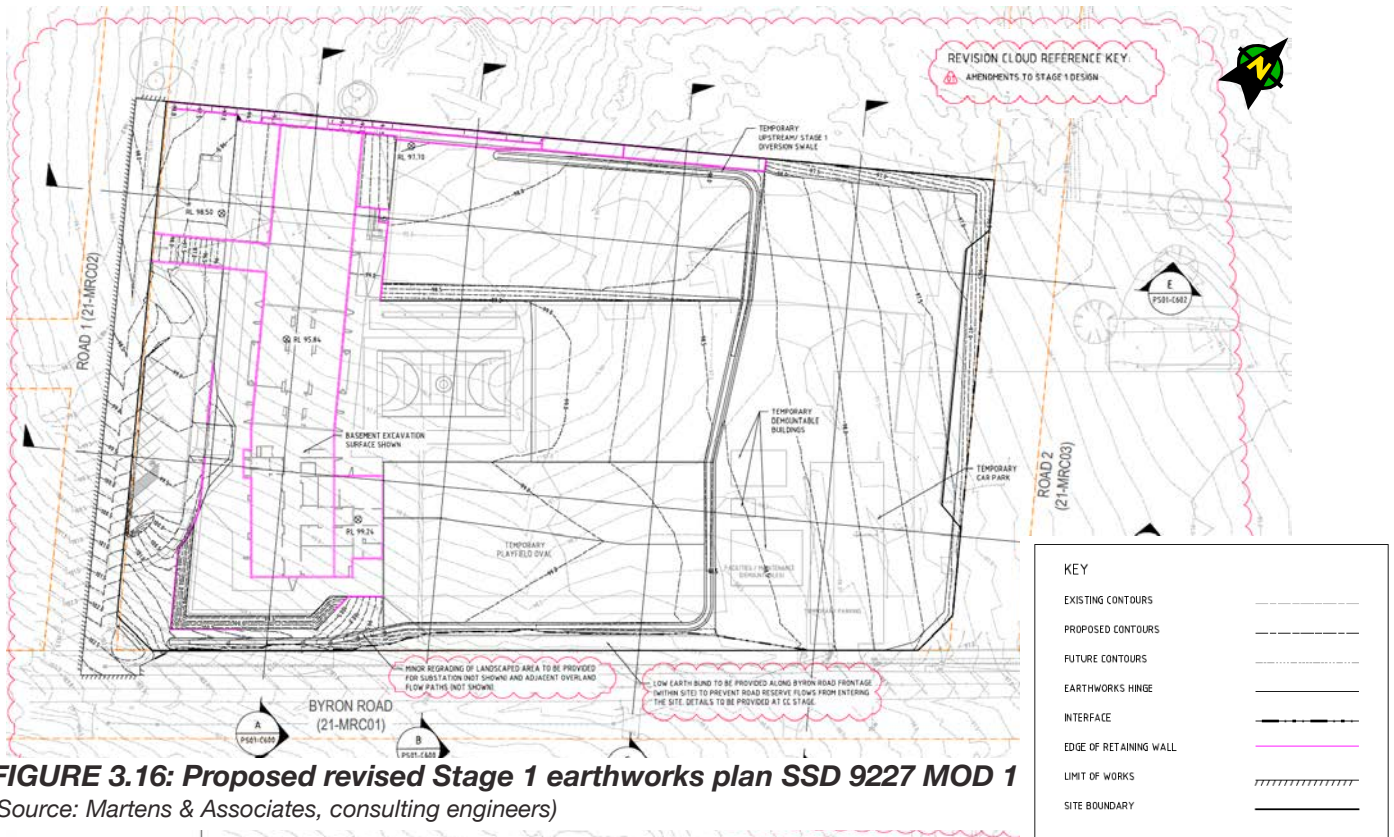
Proposed revised Stage 1 earthworks plan SSD 9227 MOD 1
